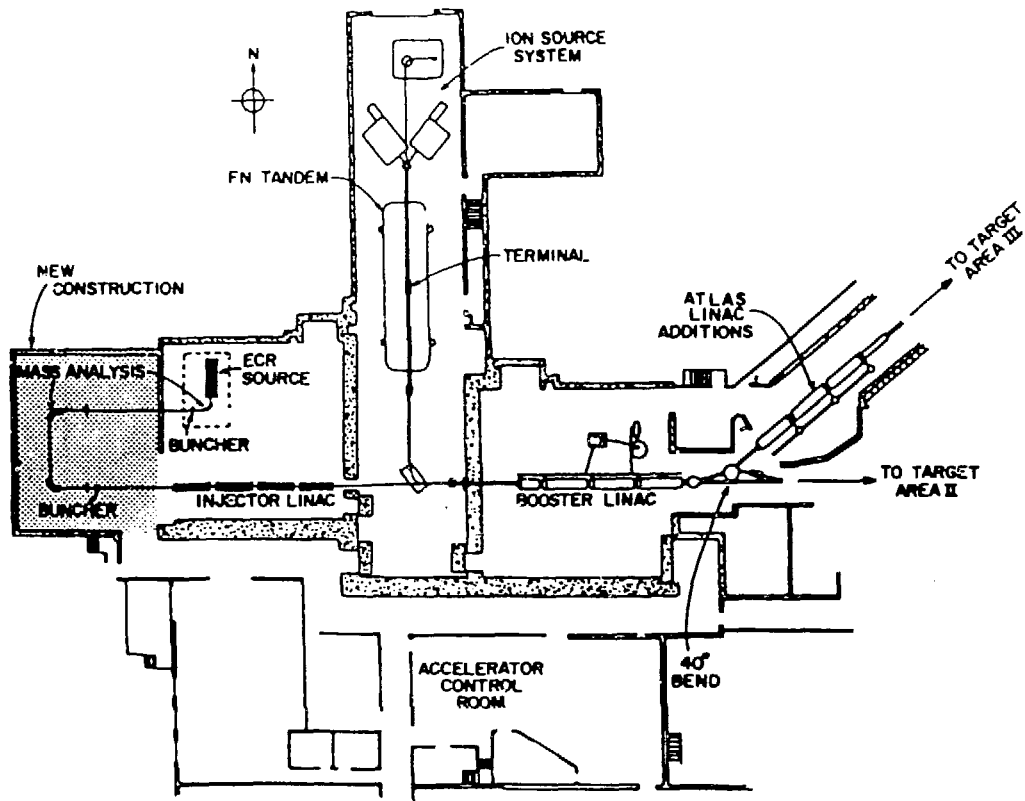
Partial floor plan of the ATLAS accelerator facility showing the layout of the positive-ion injector and the planned building addition. Construction will begin in the Winter of 1986-87.
